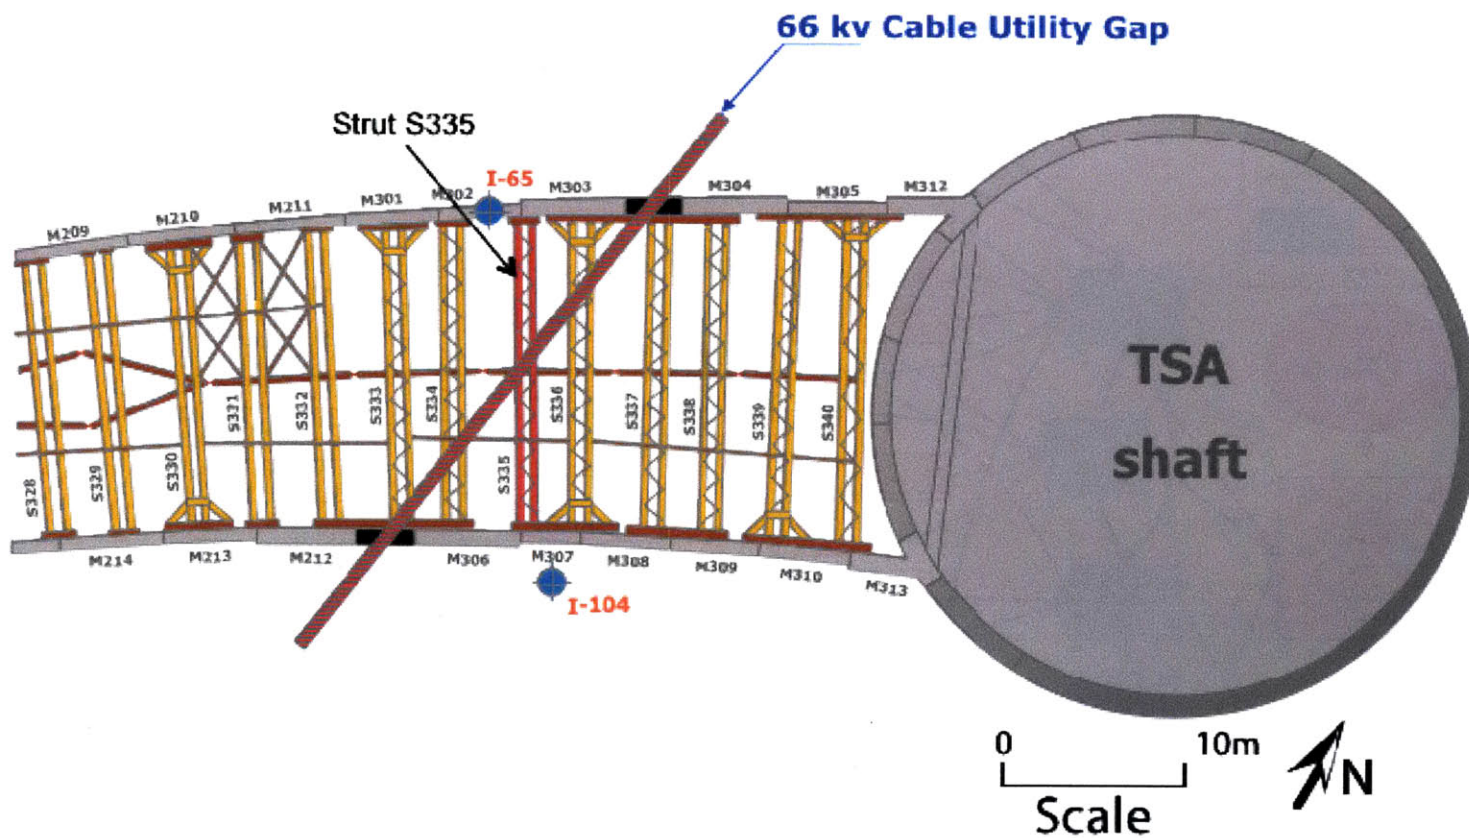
Plan showing the structural support system and 9th level strutting and monitoring instrumentation (Corral & Whittle, 2010)
